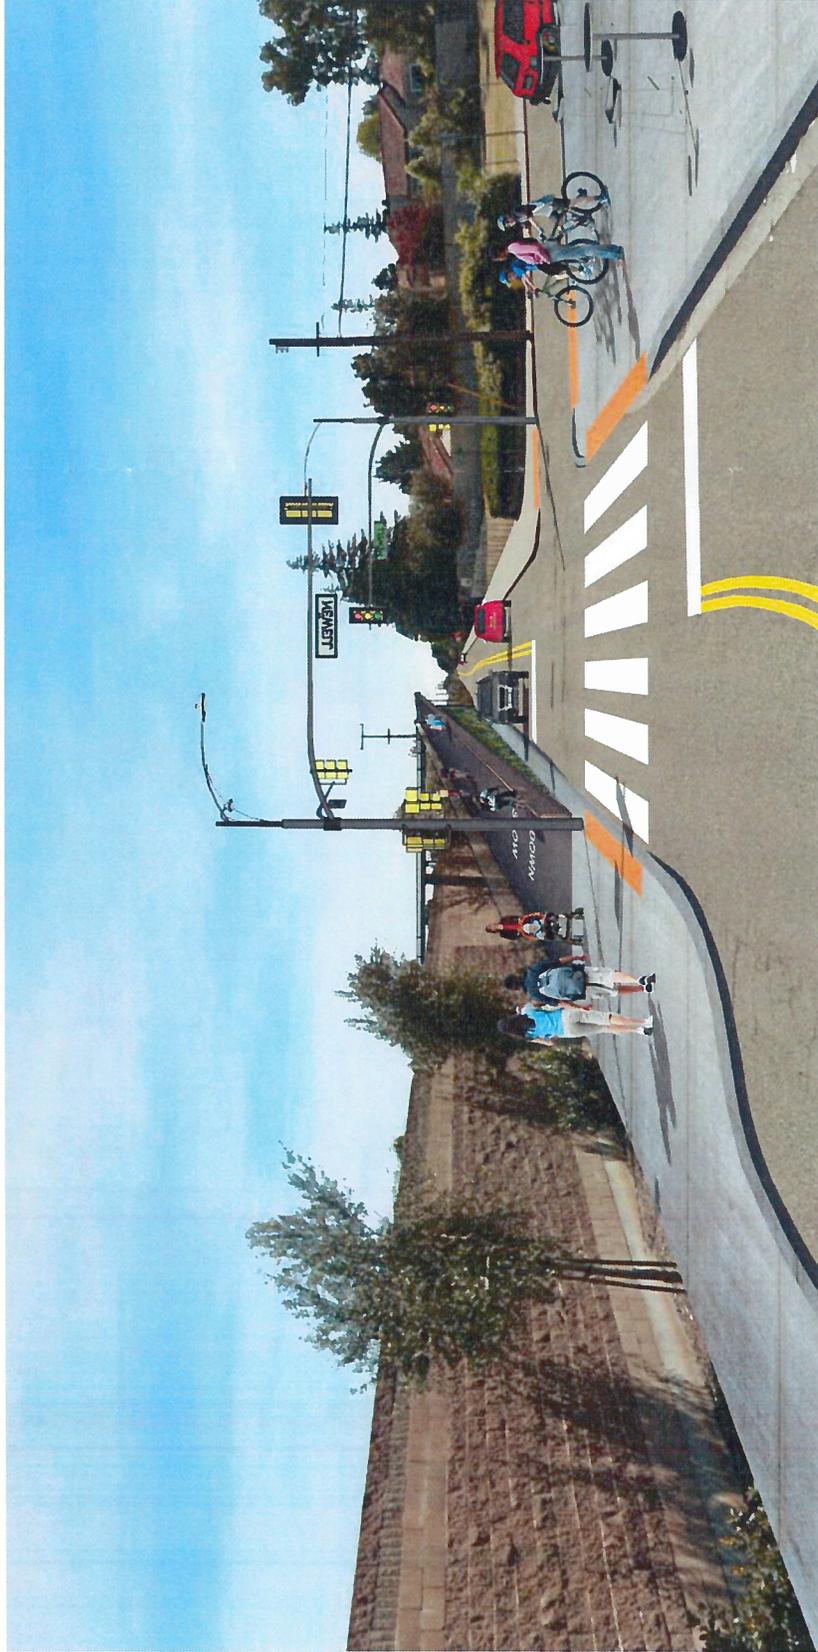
Conceptual rendering of the proposed southern ramp of Alignment 2A, with a narrowed West Bayshore Road and new traffic signal and pedestrian crossing at Newell Road.
